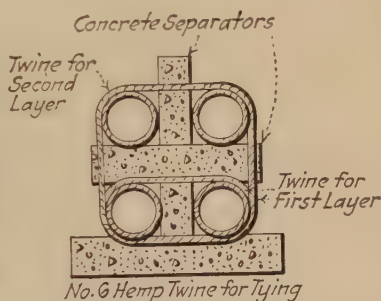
End view of conduits showing method of placing the separators and tying twine.
